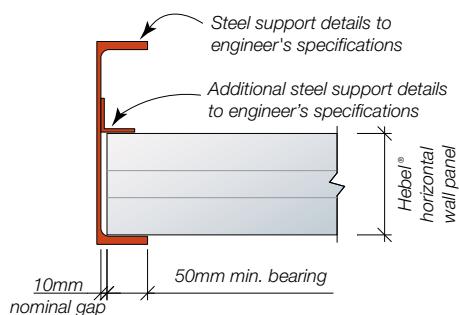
Horizontal wall panel & steel support - panel end detail (plan).
